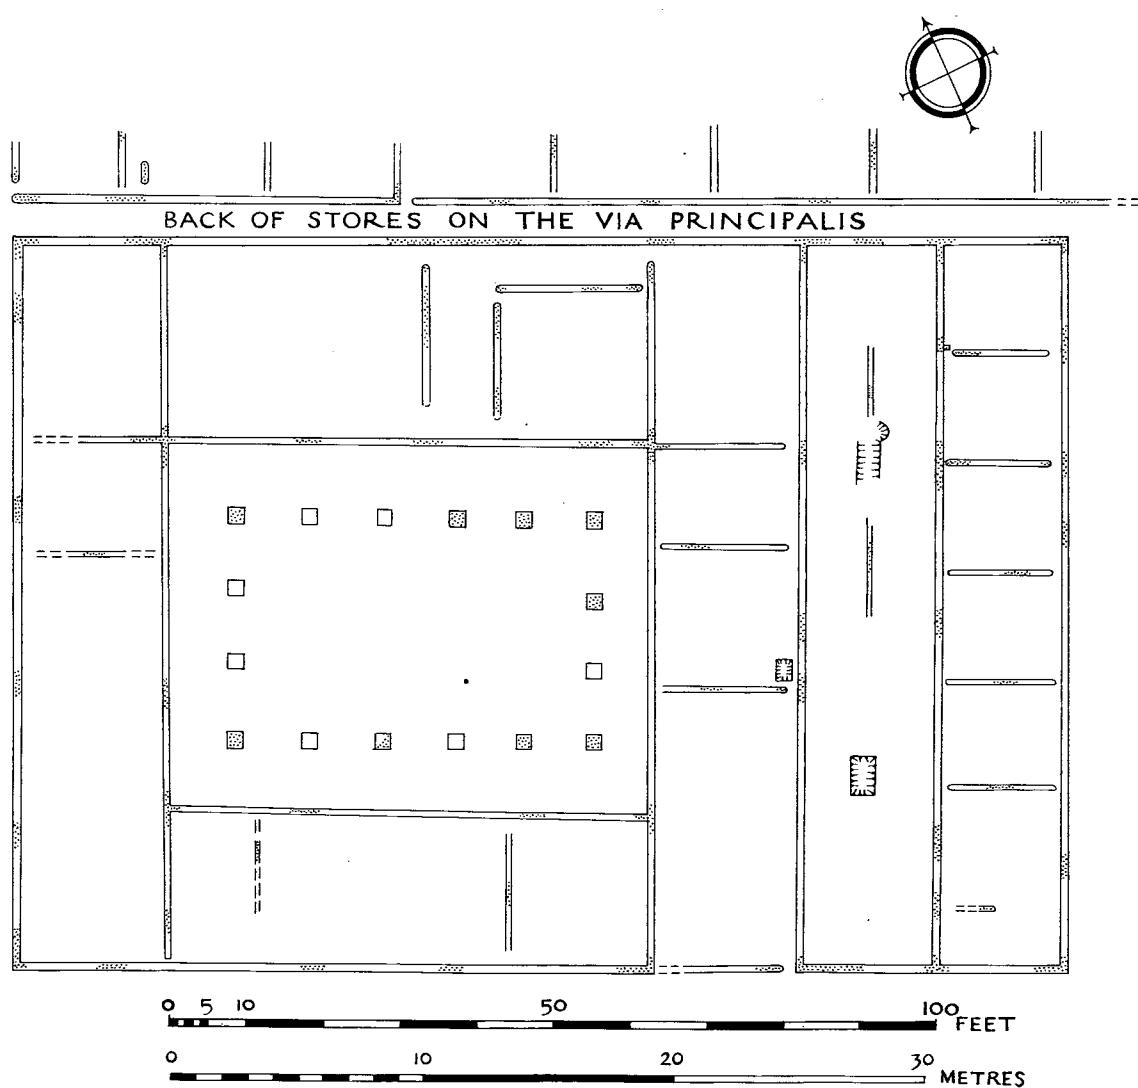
Tribune's House No. IV, plan. Scale, 1:300.
